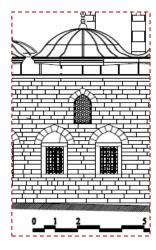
Typical room window order of the Beyazıt Medrese (detail from Figure 3.8.)
